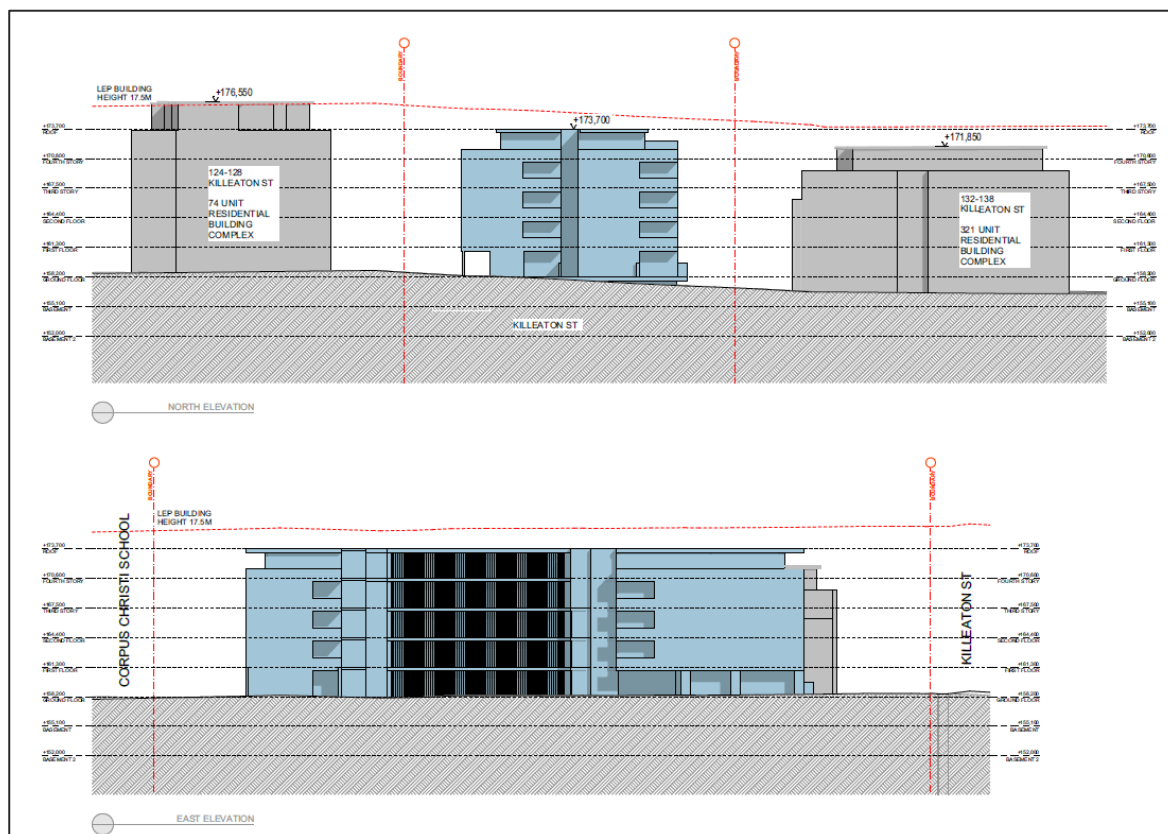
Proposed north and east elevations (Source: mackenzie architects concept architectural plans)
